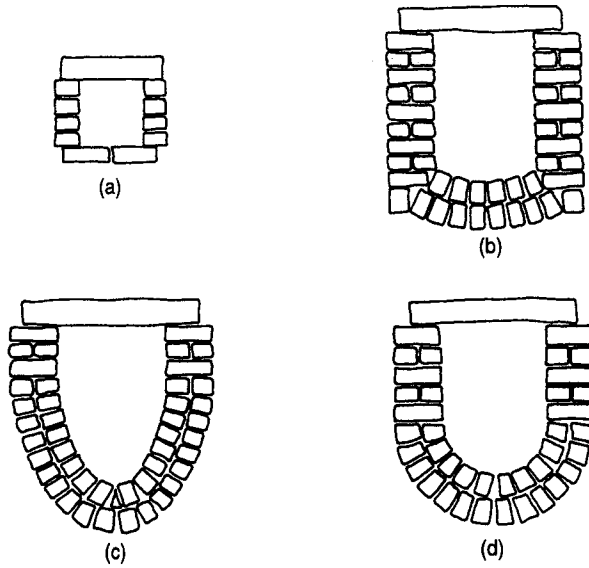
Typical cross-sections of early sewers in Manchester.
